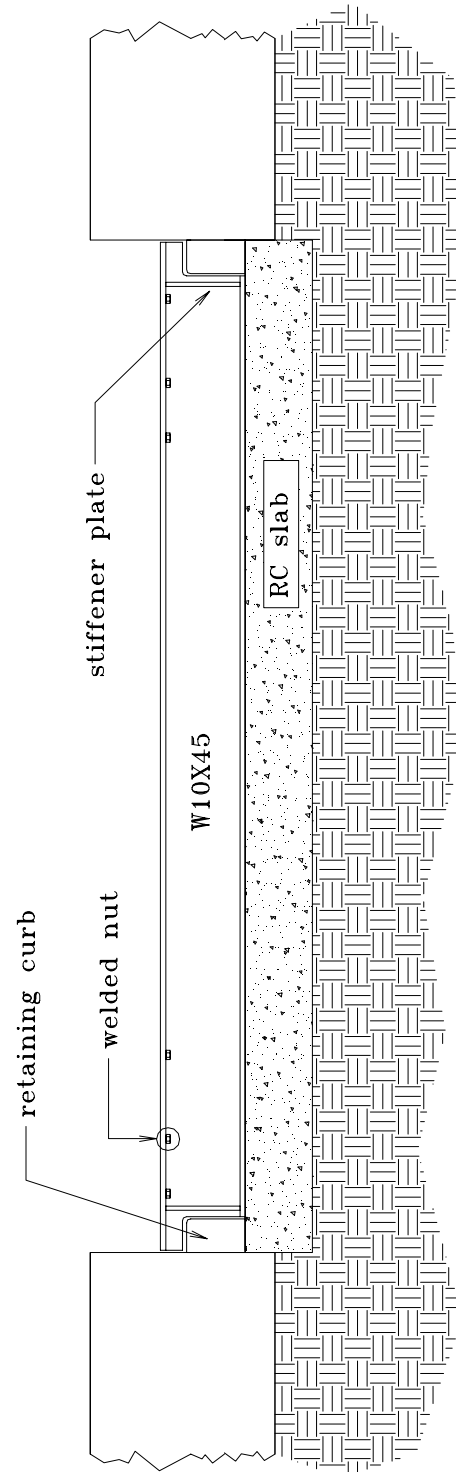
Section B-B (from Figure 3.1) of the weigh station testing facility
